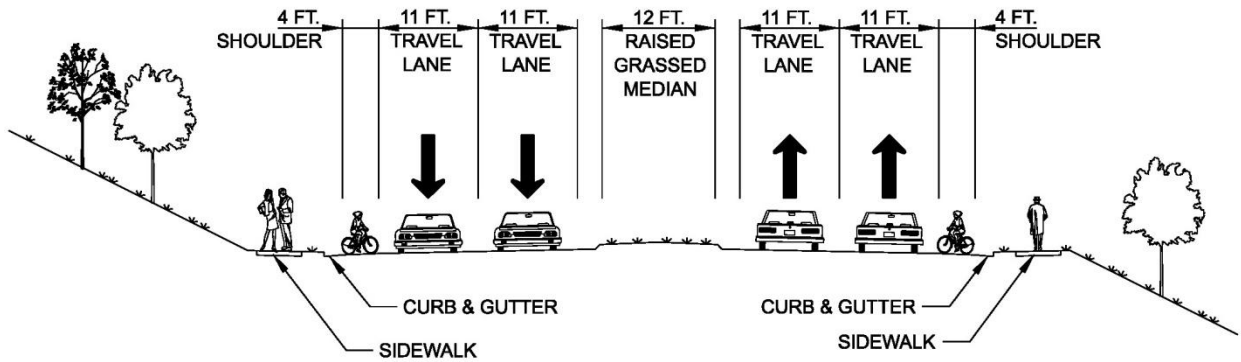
SEGMENT 3A PROPOSED TYPICAL SECTION
